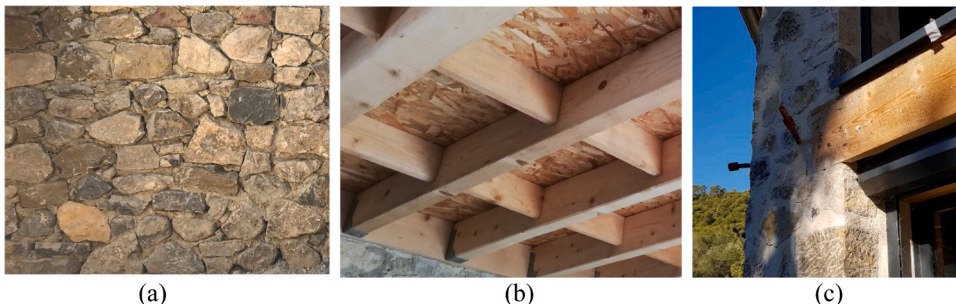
(a) The texture of stone masonry wall, (b) timber beams, joists and plank of floor slab and (c) tie rods connections between walls.
